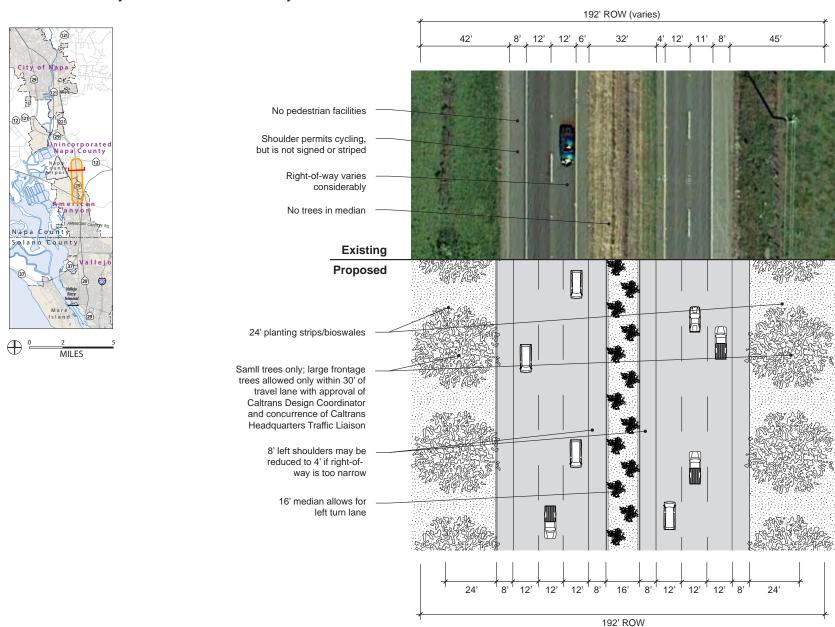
Proposed Segment - Segment 4 Rural Highway Concept (South Kelly Road to Jameson Canyon Road)
